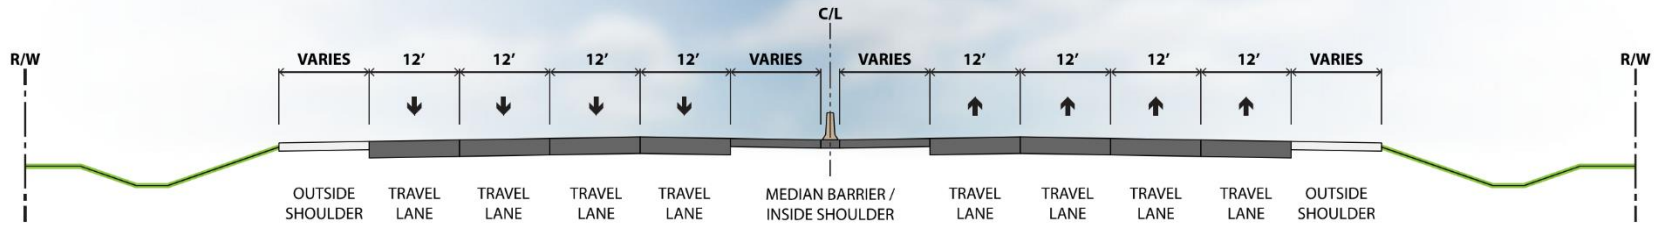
Typical Section of I-65/70 from South Split to Washington St in Downtown Spoke
